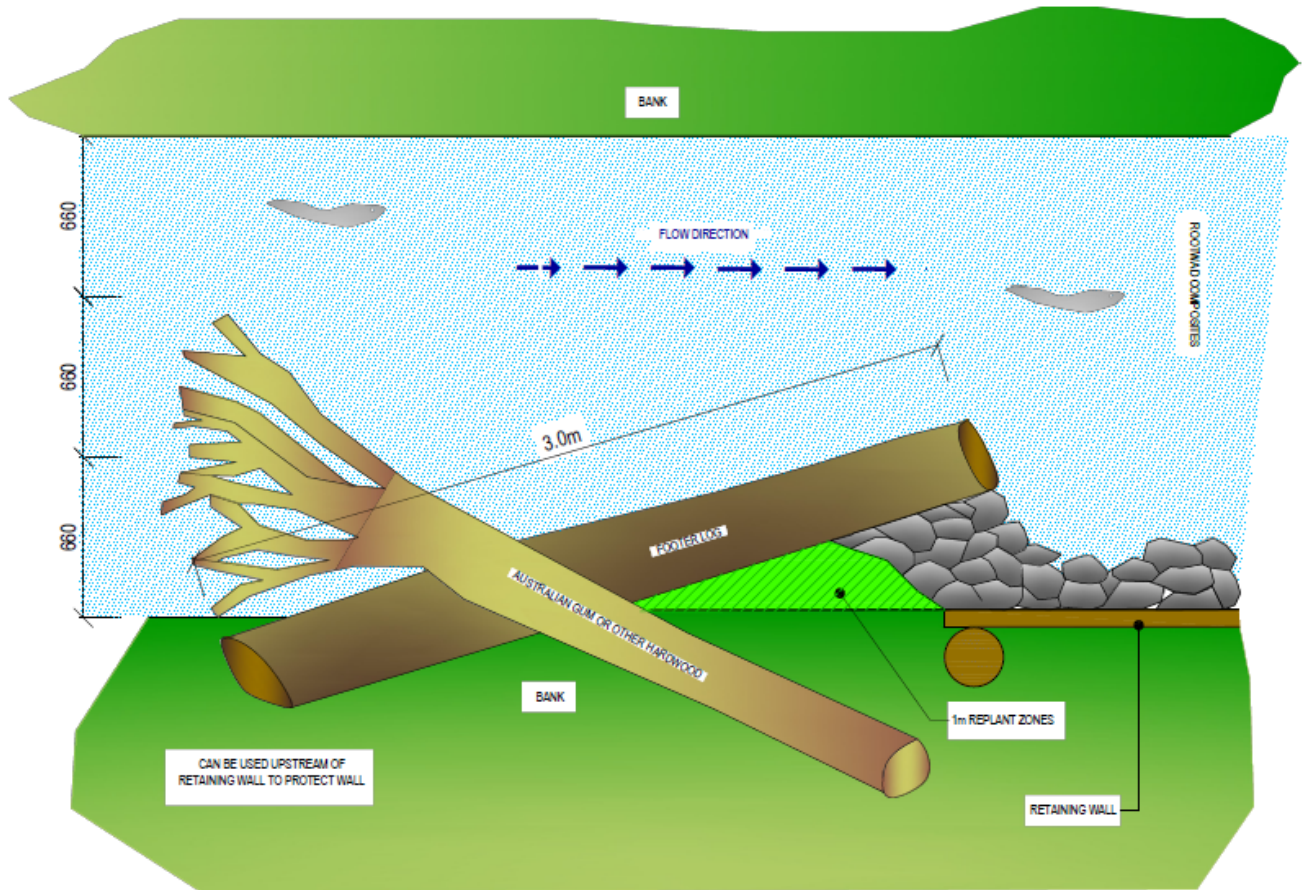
Root wad composite situated upstream of a retaining wall to prevent erosion behind the retaining wall.
